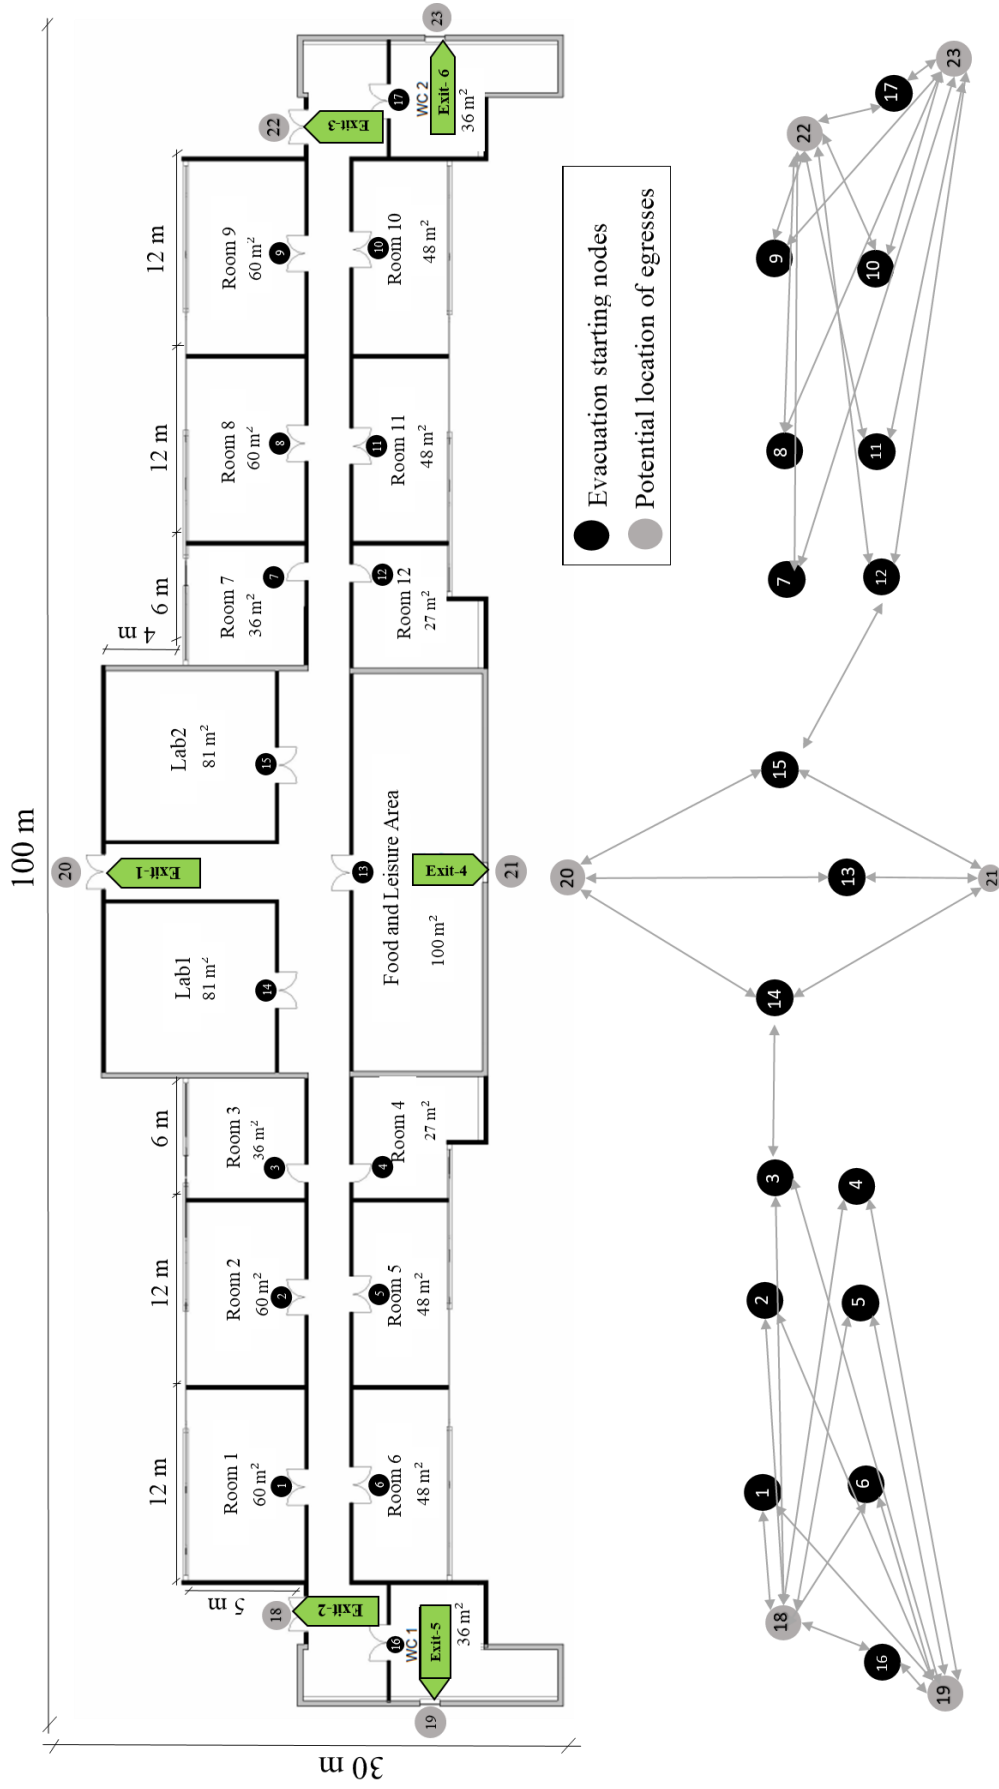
(a) Building layout for the typical school with proposed six egress locations, 2D. (b) Network representation highlighting nodes of the school layout (m refers to metre).
